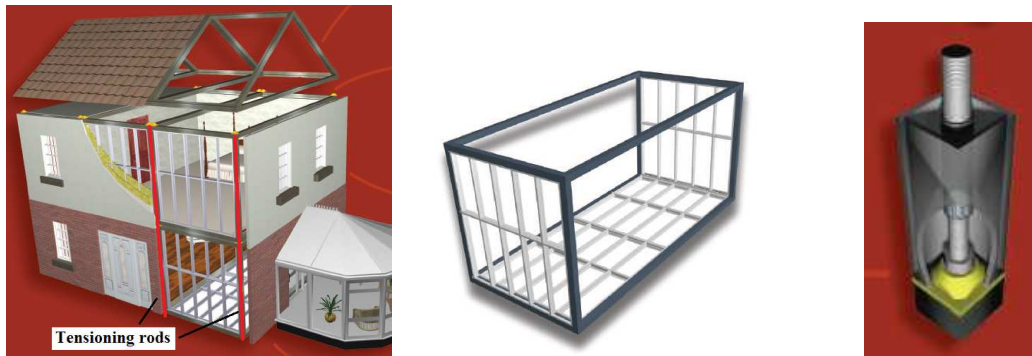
Building structure made from modular units and tie rods (courtesy Powerwall 2008)
